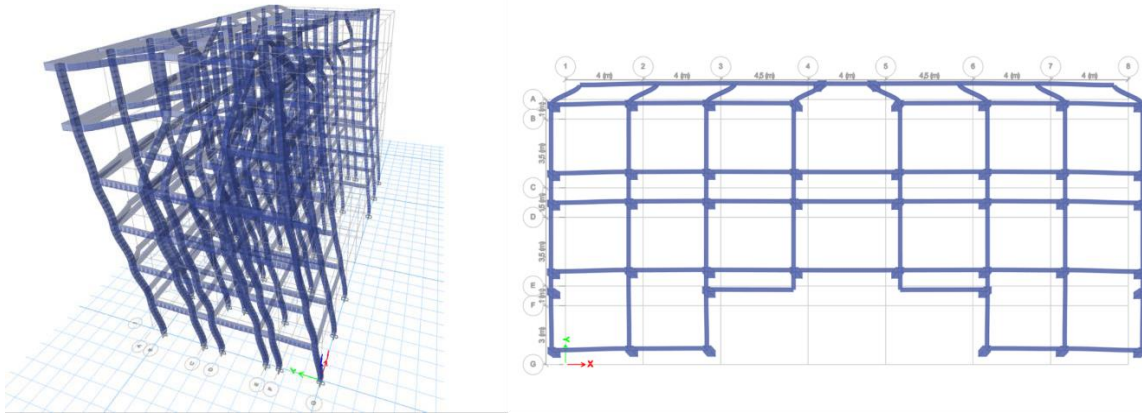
Deformed shape of structure with flexible slab under seismic action
